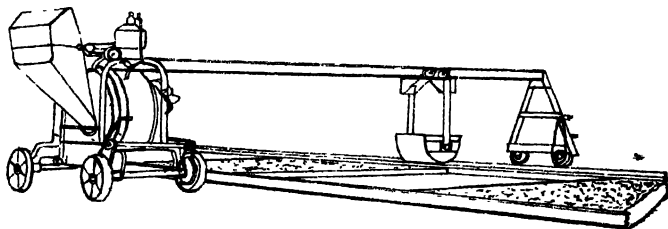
MIXING AND DISTRIBUTING PLANT FOR ROADWORKS
